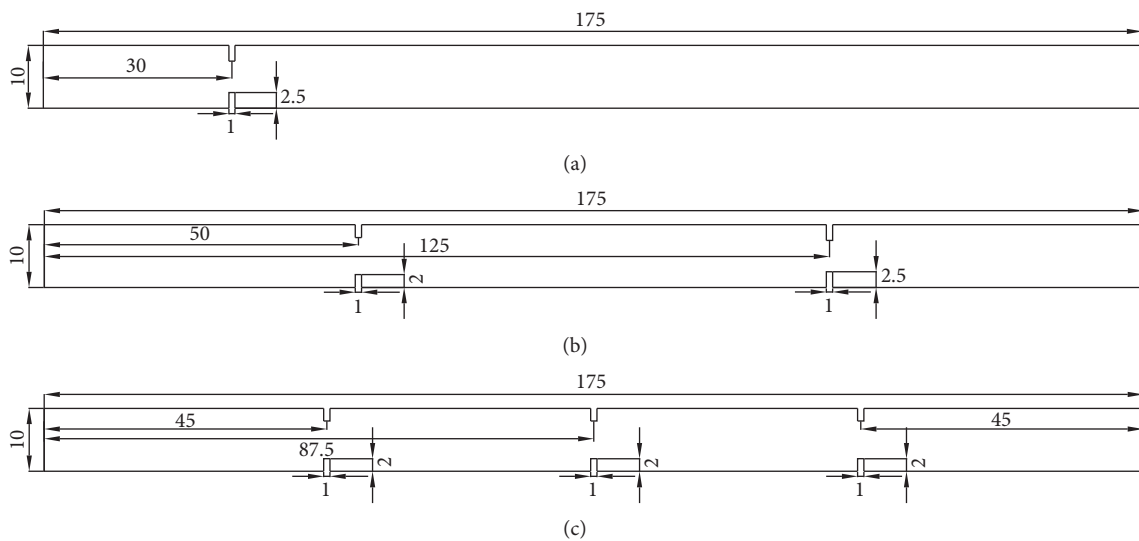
Steel beam damage setting (unit: cm). (a) Single damage. (b) Two damage. (c) Three damage.
